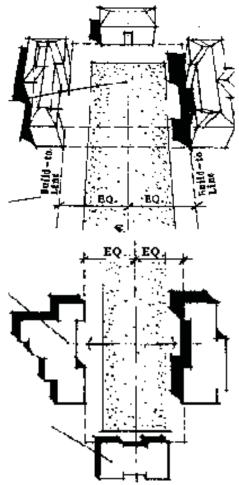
Buildings sited around common open space should be symmetrically arranged.
